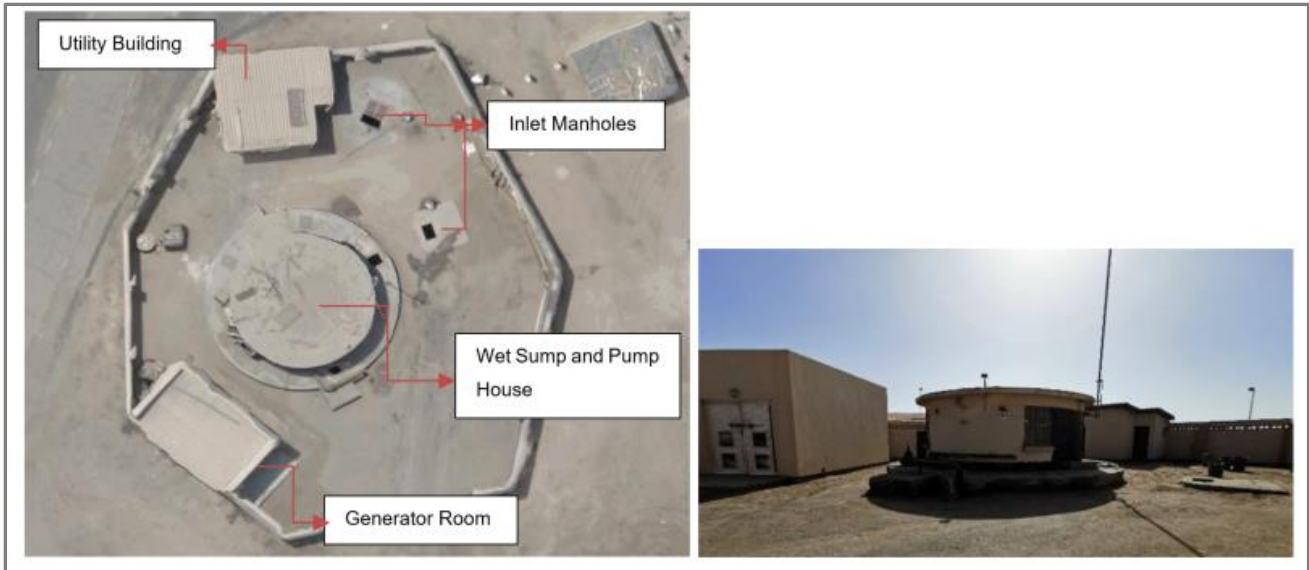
Aerial view and picture of the existing sewer pump station in Kuisebmond Walvis Bay
